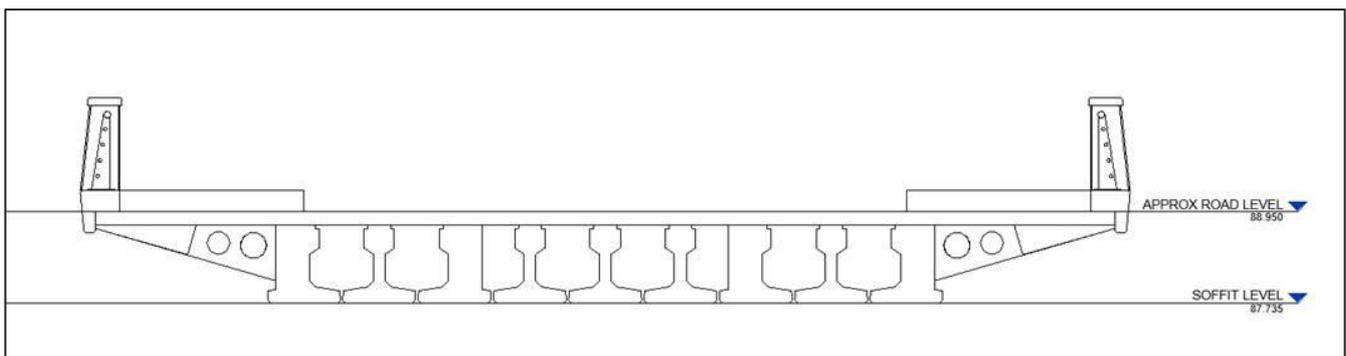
PROPOSED BRIDGE CROSS-SECTION.
